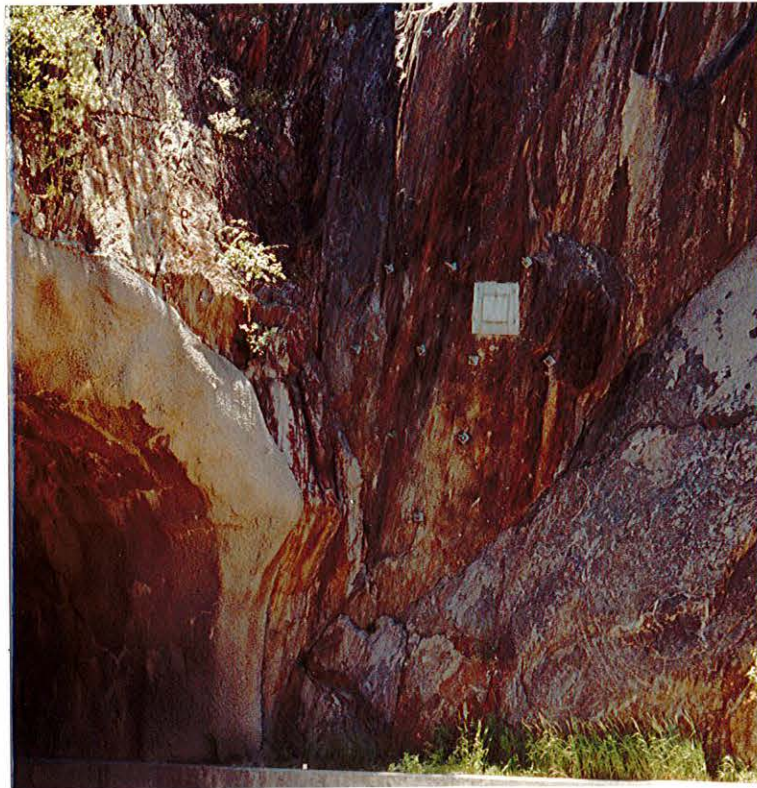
Mechanical stabilization (rock-bolting) in RUA.
